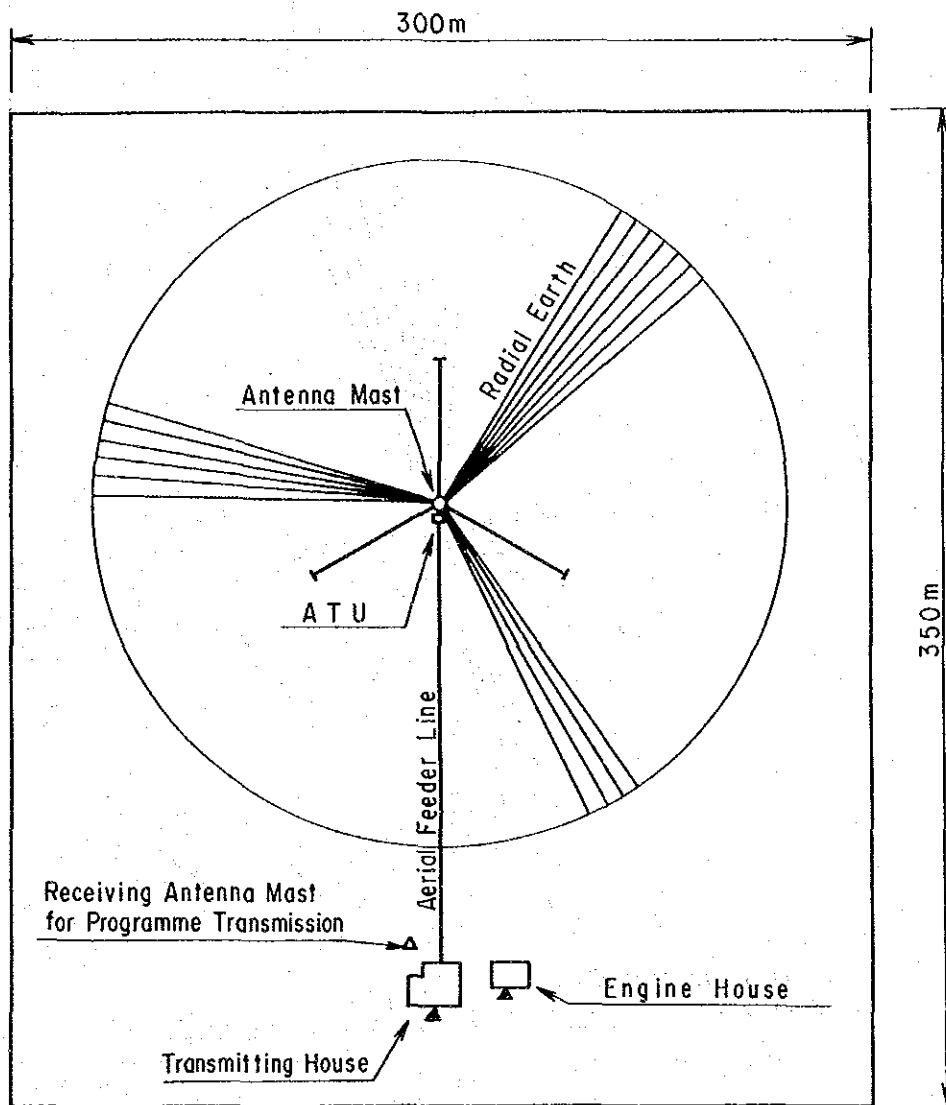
Bukittinggi Transmitting Station ; Site Plan
